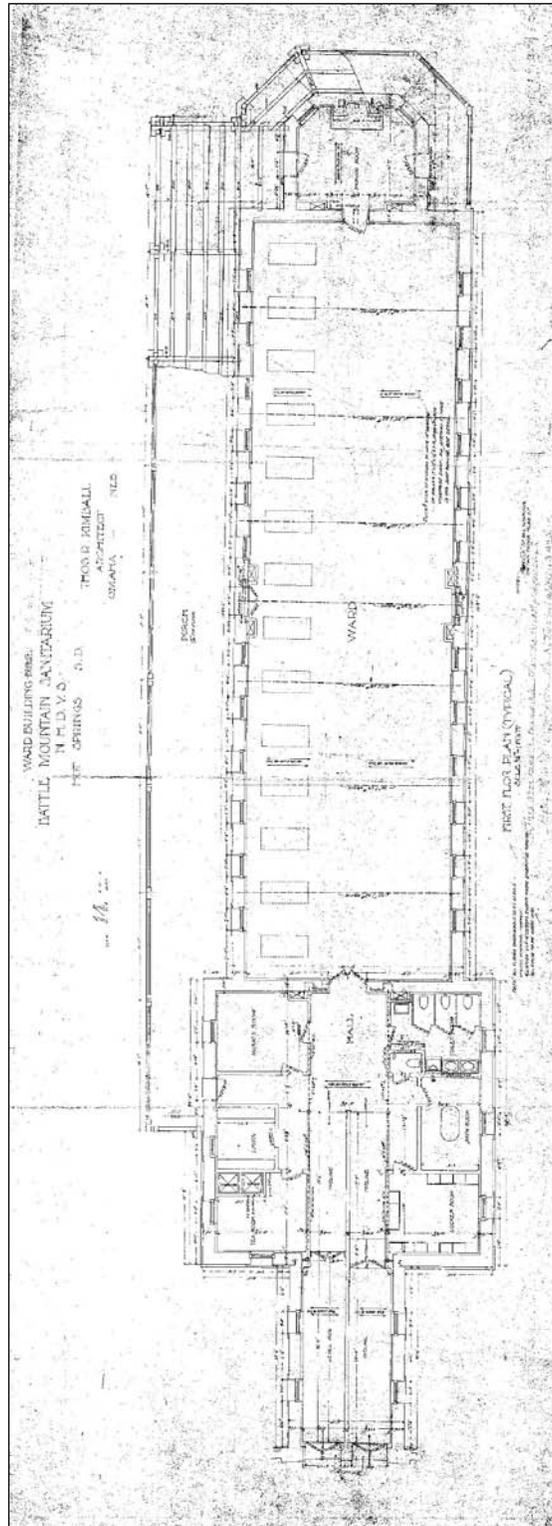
Thomas Rogers Kimball, Ward 2 (now 4), First Floor Plan (Typical), (11 June 1903)
